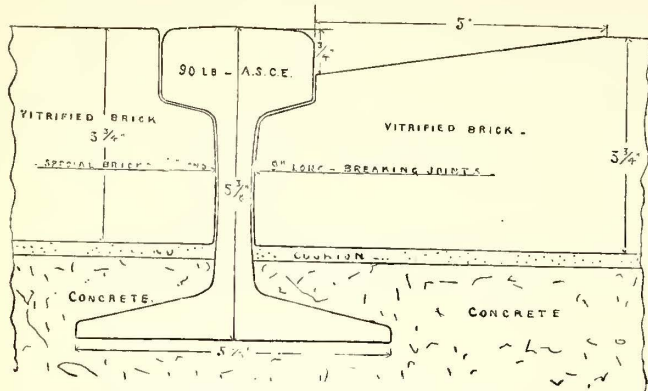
LATEST CONSTRUCTION IN KINGSTON, N. Y., SHOWING SPECIAL BRICK OUTSIDE OF RAIL.
